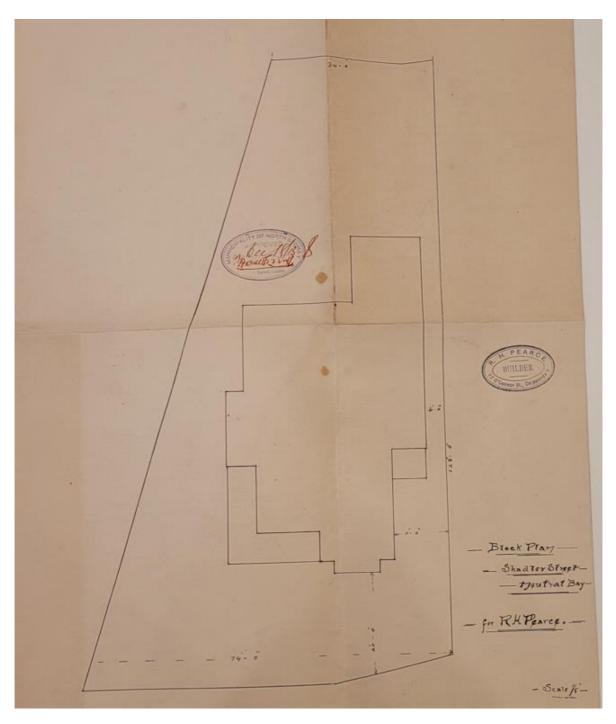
Block plan of Shadler Street, Neutral Bay for RH Pearce, 1913. (Source: NSMCA 91/5, Folder P, 1913)
